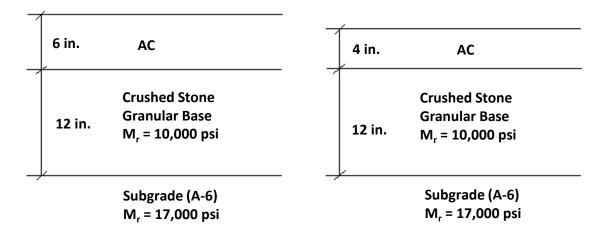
Flexible Pavement Sections Used in the MEPDG Simulation Runs⁽³⁶⁾
